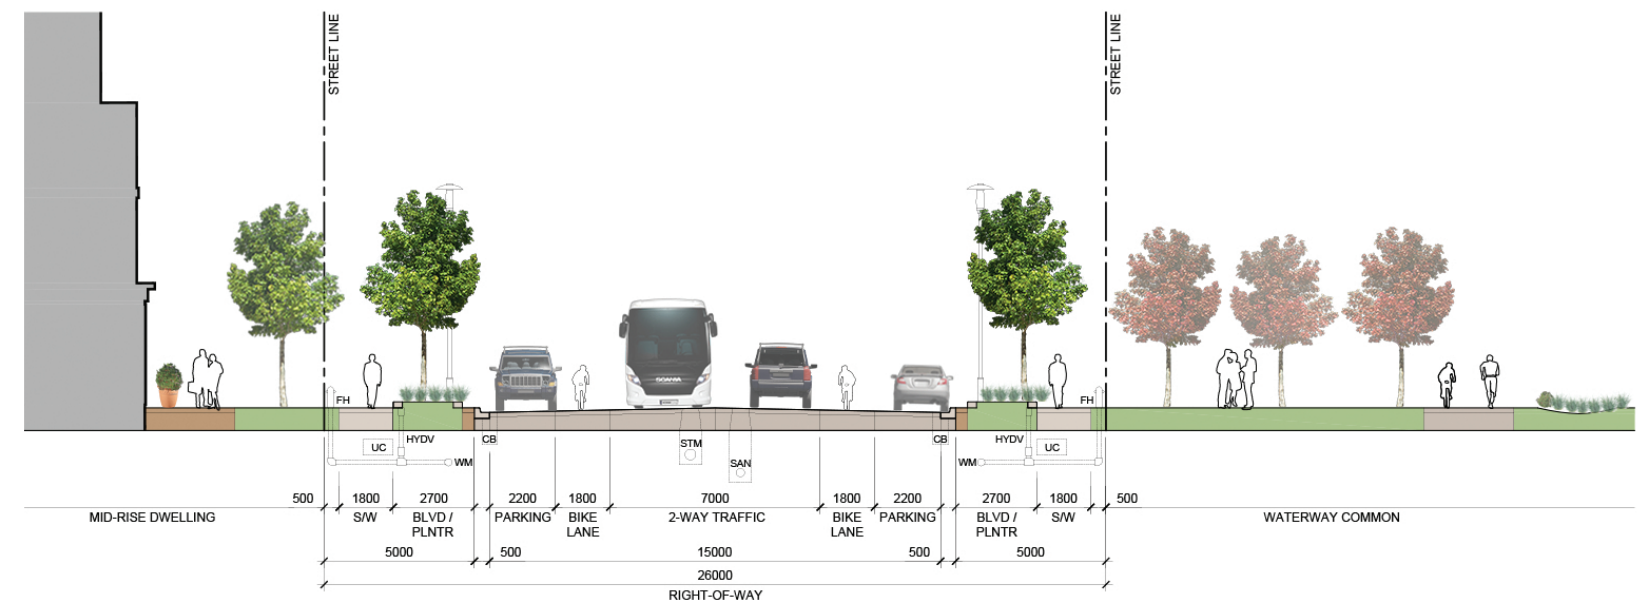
Example of a stormwater planter integrated with the streetscape design in an urban setting
